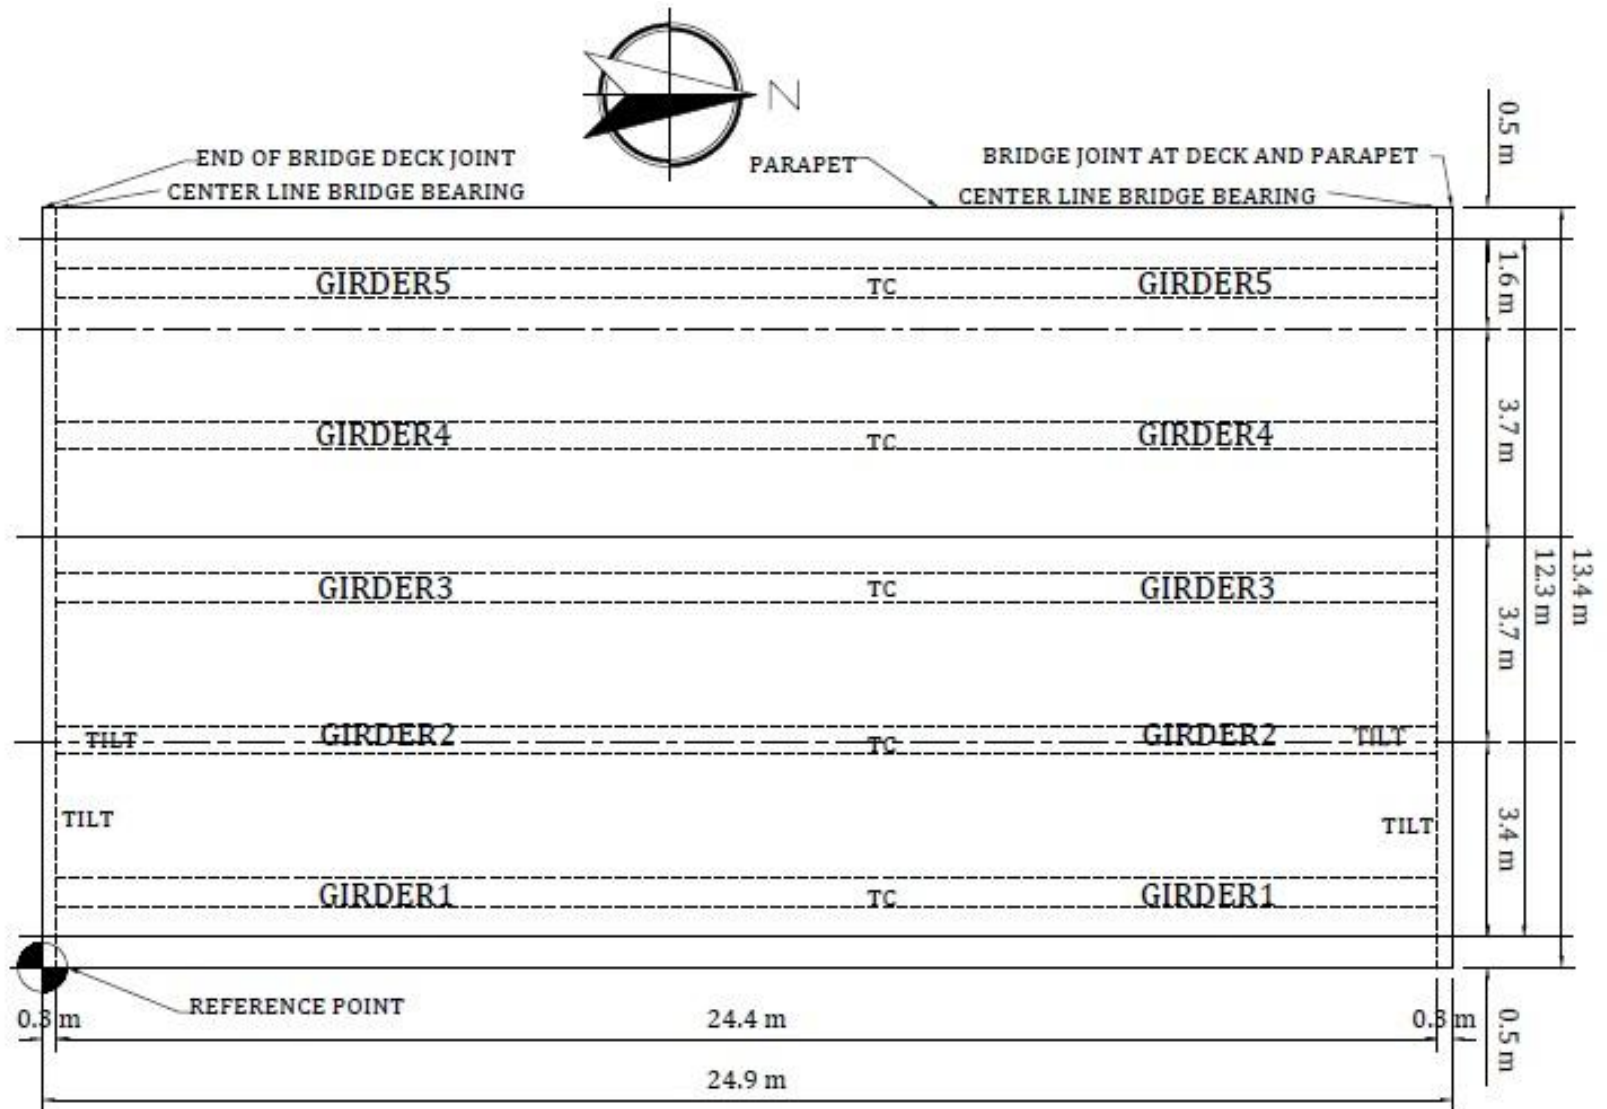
Plan view of the Utah Bridge with Thermocouples and Tilt-meters located.
